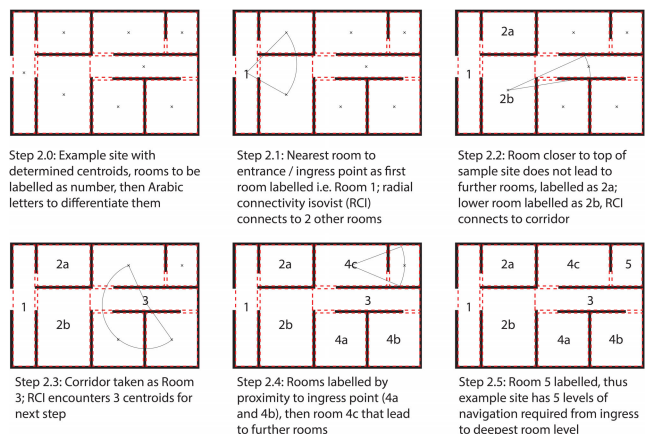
Rooms numbered based on their proximity and connection to preceding rooms.
